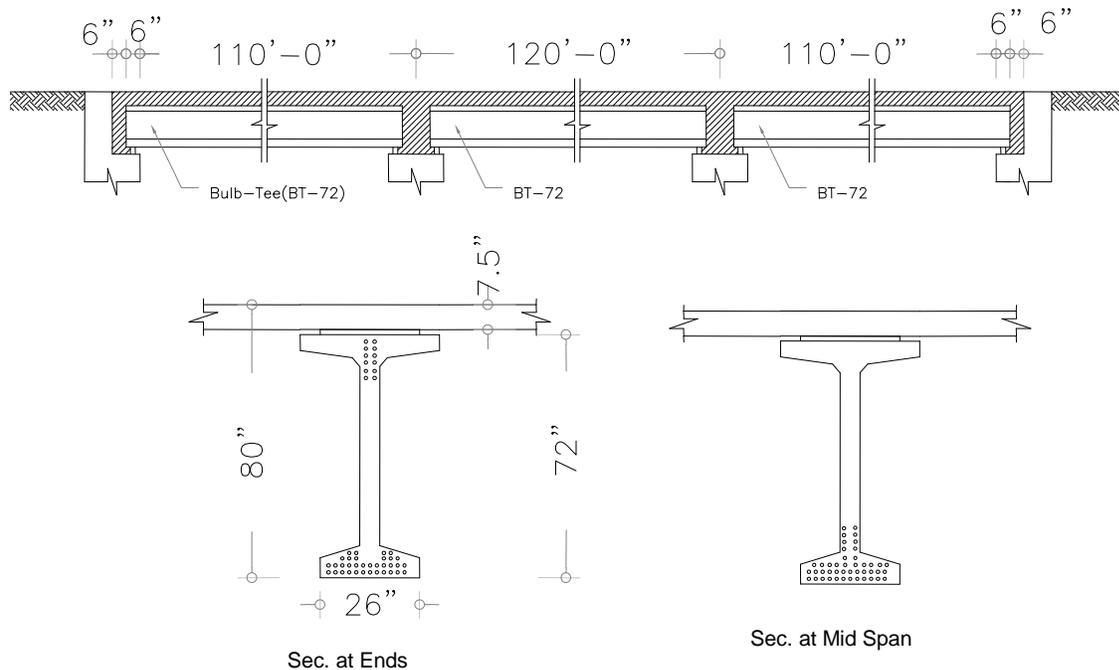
Profile and sections at mid-span and at end of continuous Bulb-T (BT-72) member.
